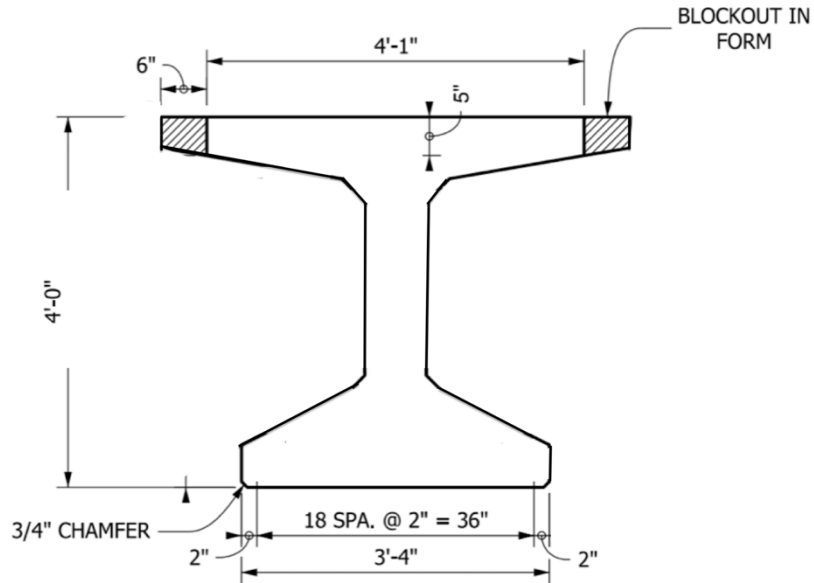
Precast Bulb-Tee 48 Girder Drawing
